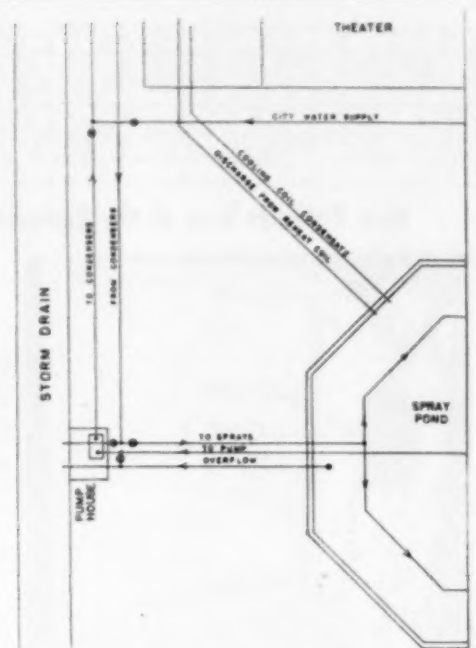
shows the water piping connections for the system which made use of a spray pond.
